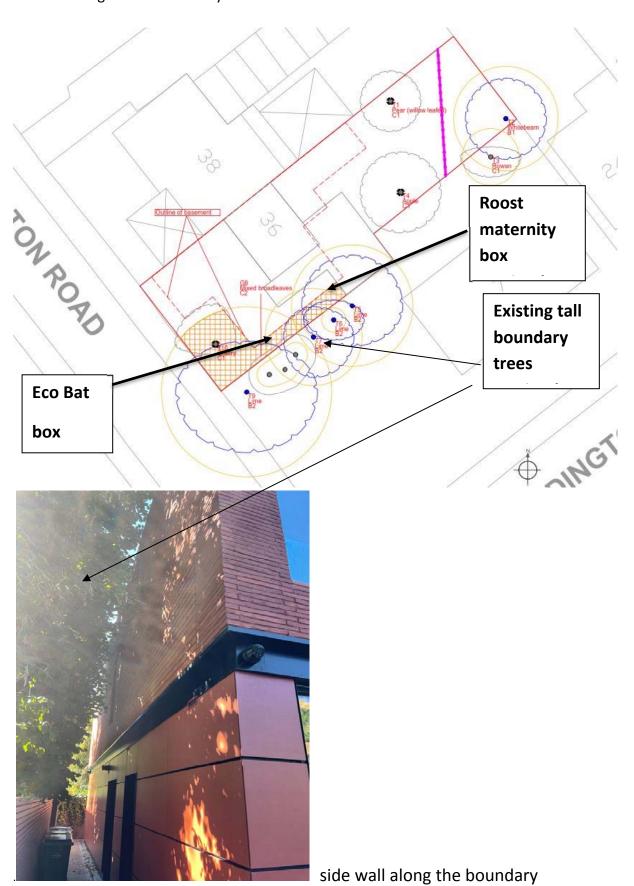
Position of the proposed bat boxes on South West Elevation.
